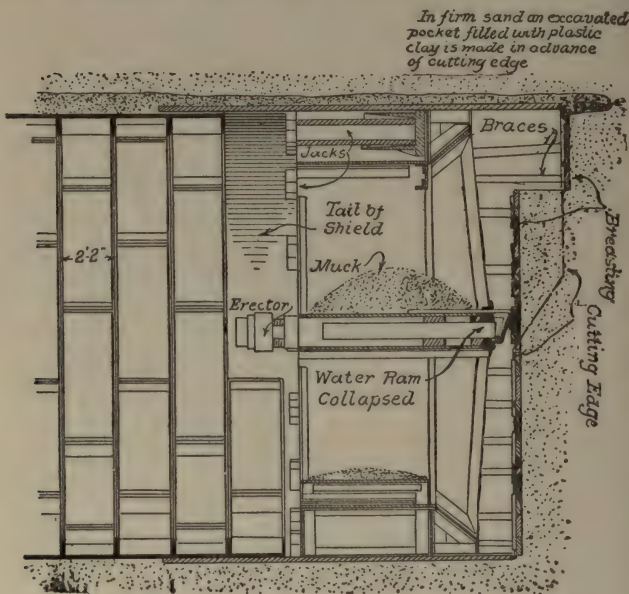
DIGGING IN FRONT OF THE SHIELD.
